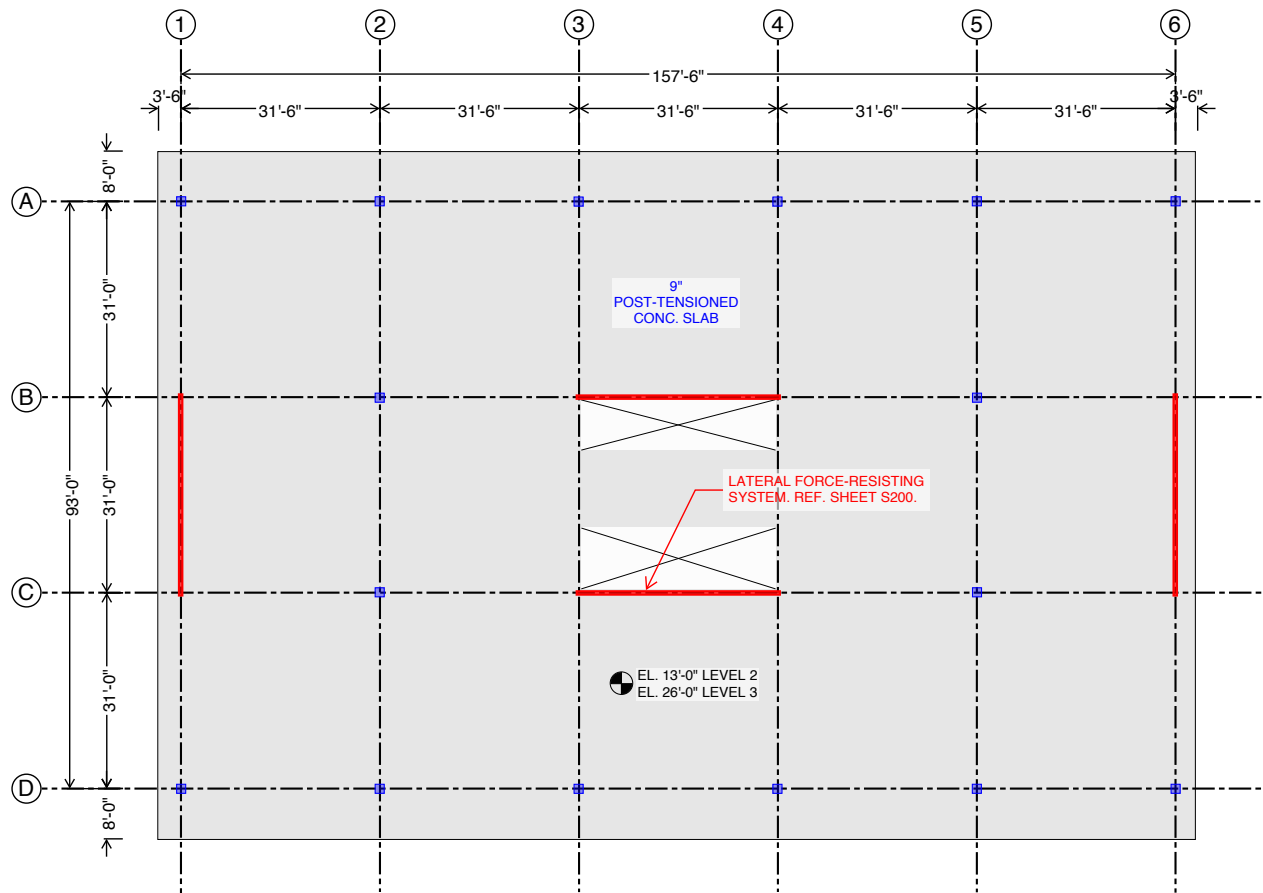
Typical floor plan for the medium reinforced concrete office building
